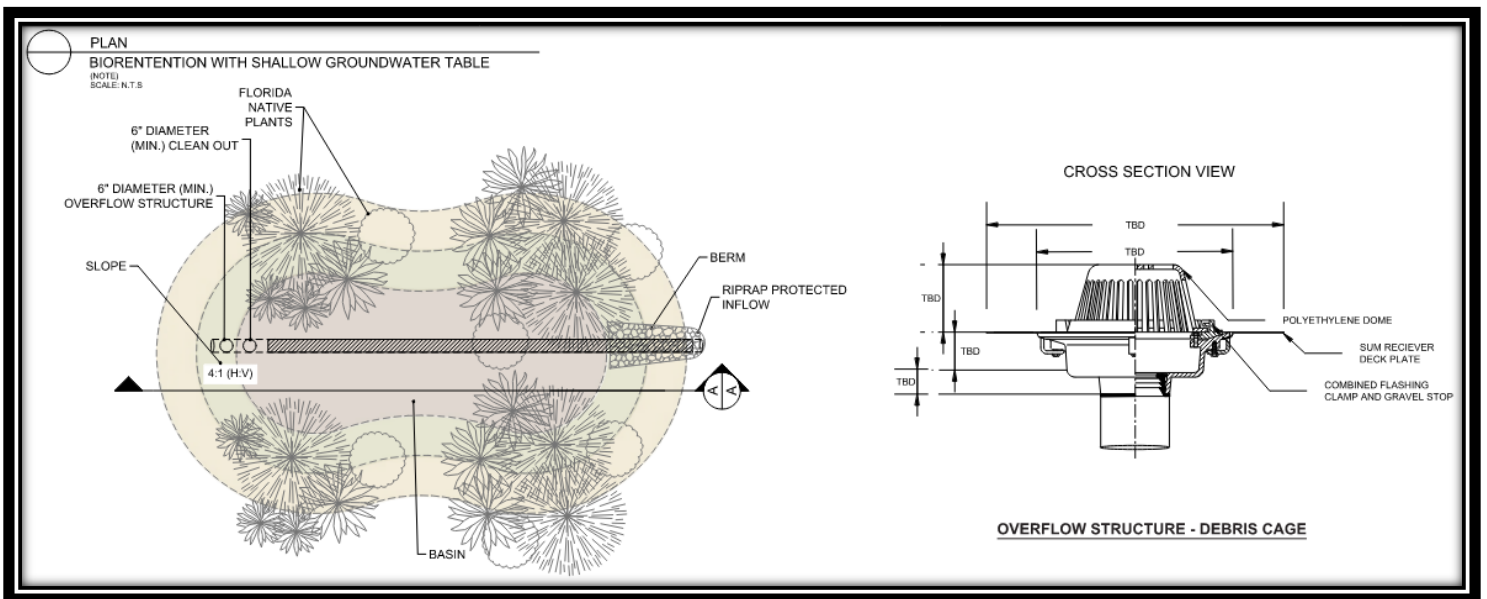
Example of a rain garden and overflow structure with a shallow groundwater table.
